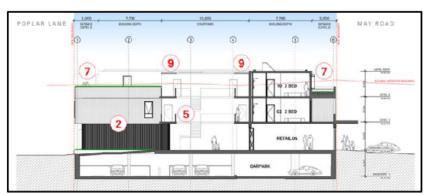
Extract of Section plan showing LEP 8.5m height line (Source: Benson McCormack Architecture, Project No. 1853A)
